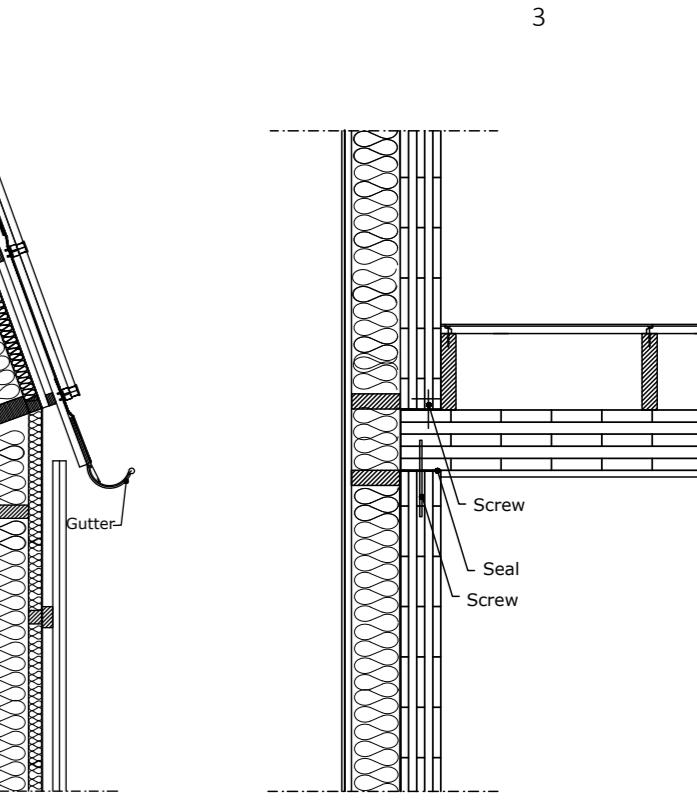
Detail-connection of wall towards Byggforsk and internal floor
